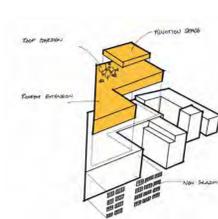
DETAILED PLANS FOR THE CUSTARD FACTORY, CUSTARD FACTORY LIVING AND WILD WORKS
